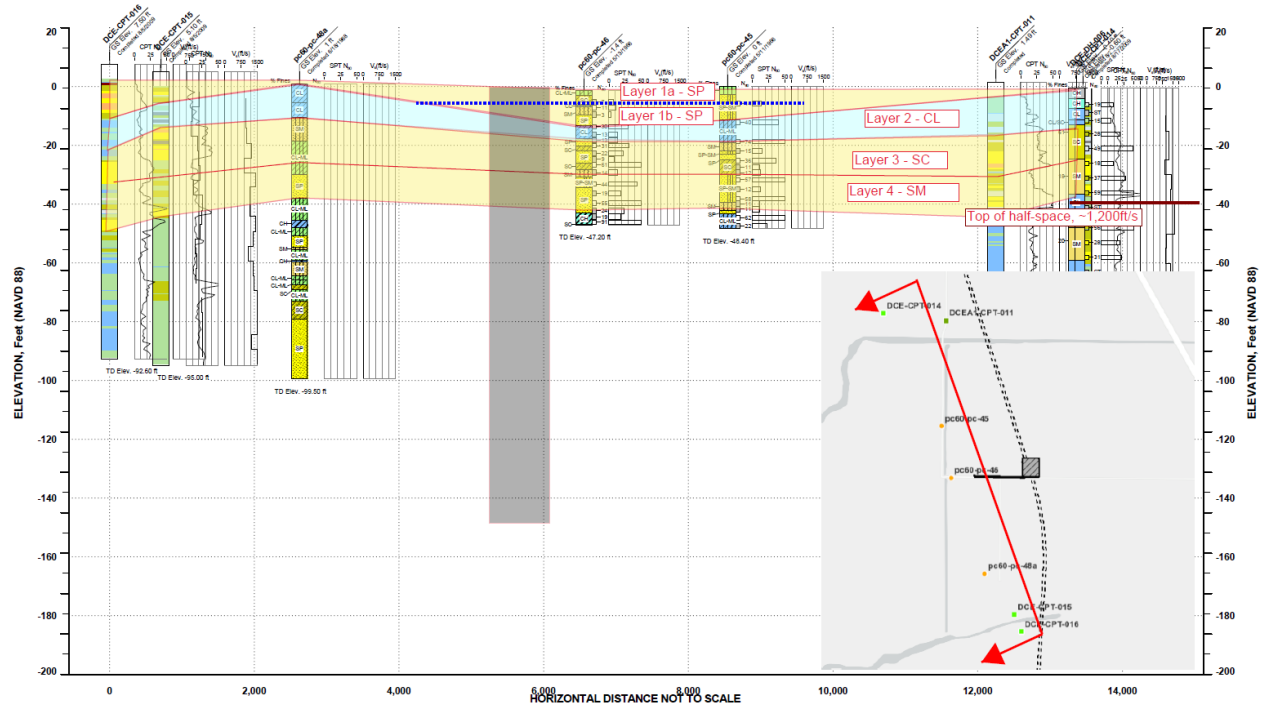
Idealized Soil Profile at Canal Ranch Tract Facility Site
